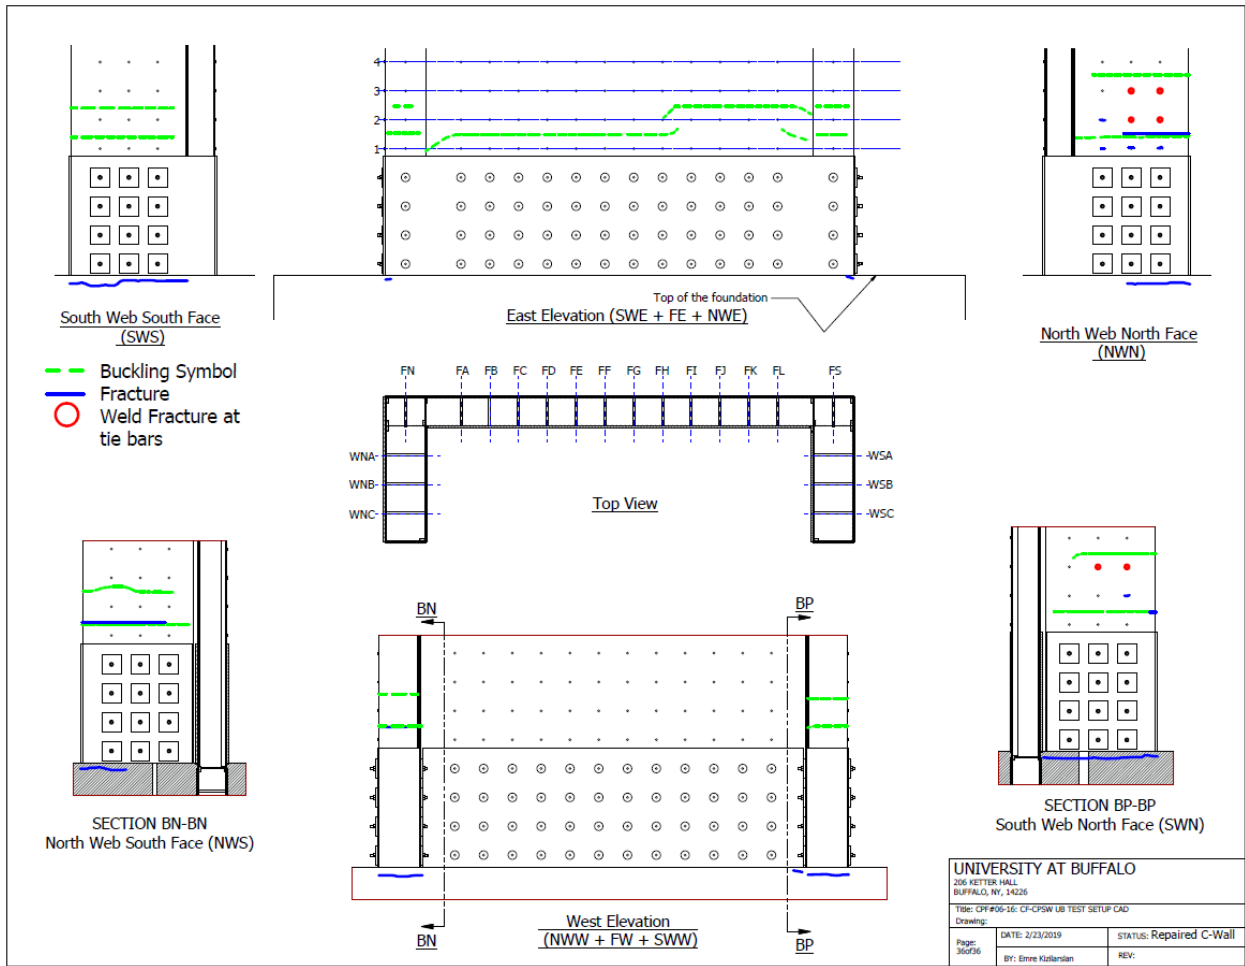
Sketch of post-test damage inspection of the wall steel plates for Repaired Specimen C2
